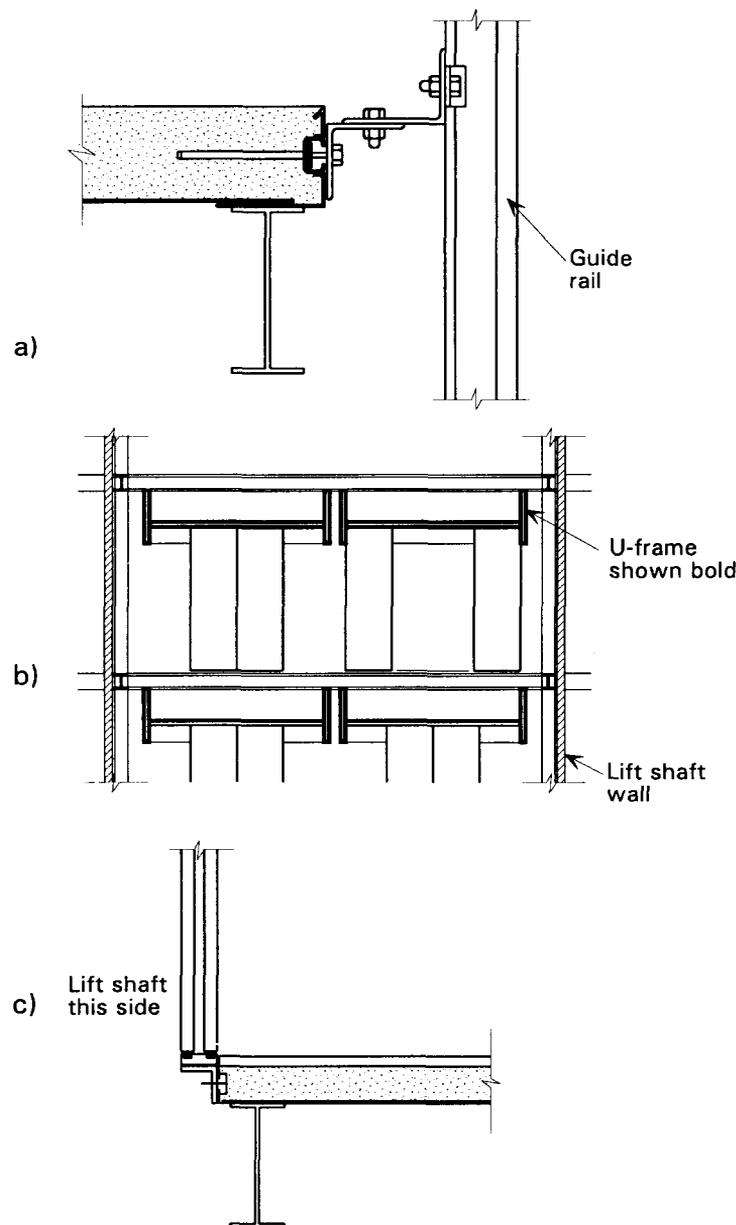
Lift installation connection details, (a) guide rail connection to slab edge, (b) suspended door support steelwork, (c) threshold
